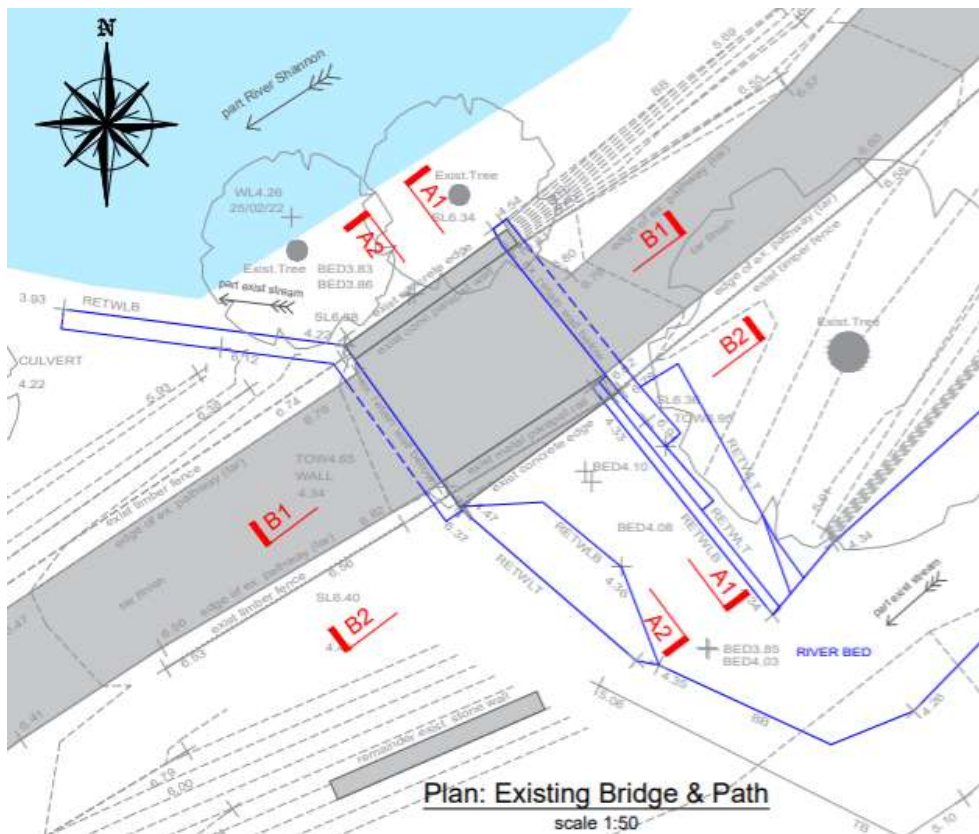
Plan of existing Bridge 1 (refer to drawing RHA-XX-DR-S-SP0010)
